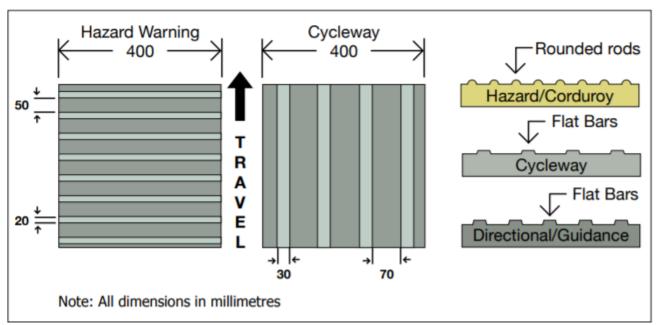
Examples of Hazard Warning and Cycleway Paving (Note: Extracted from NDA *Building for Everyone: A Universal Design Approach*)
